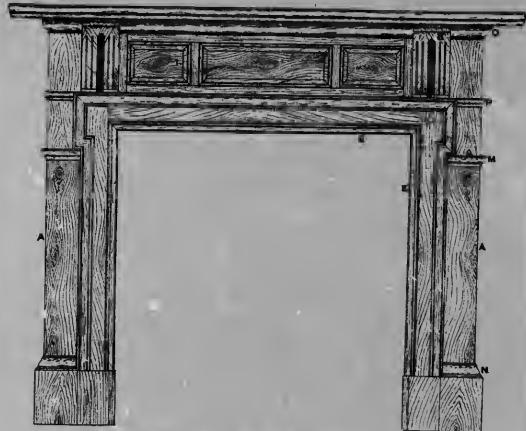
Front Elevation of Chimney-piece Ornamented with Mouldings.
